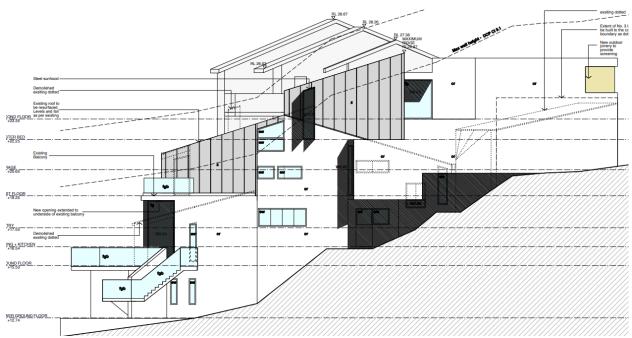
Extract from DA198/2010 showing approved eastern elevation
